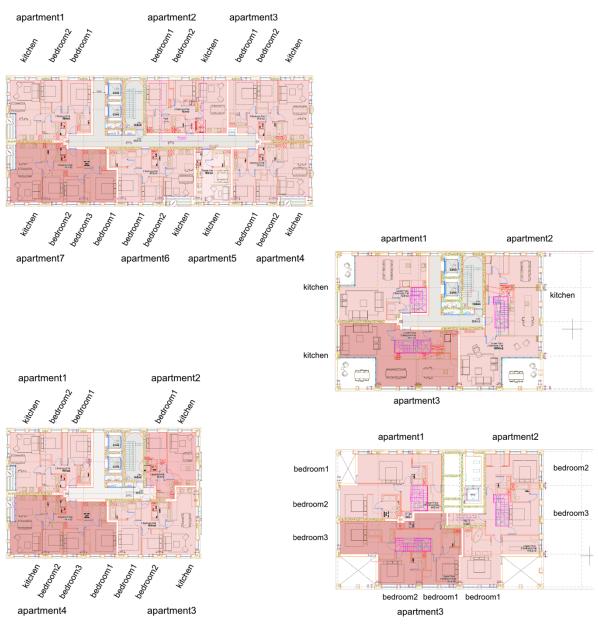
Naming convention. Top left – Apartments floors 1 to 7; Bottom left - Apartments floors 8 to 13; Right - Apartments floors 14 and 15
